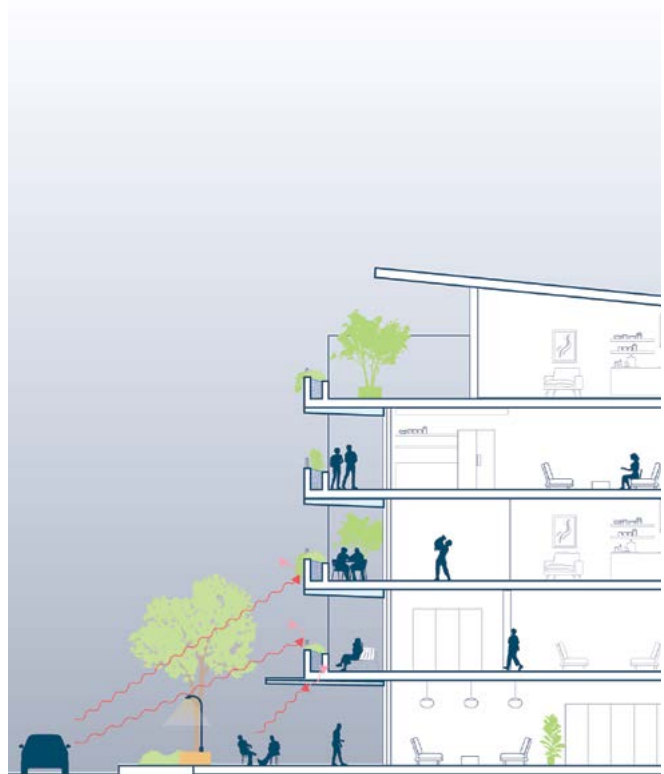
Balcony design can help reduce road and street noise through soffit material choice, screening and planting while allowing for cross-ventilation and views.
